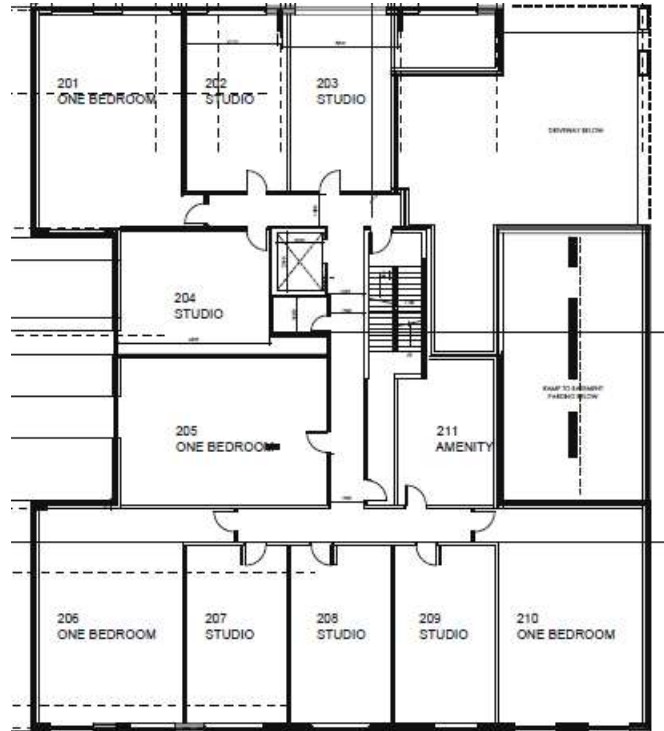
Exhibit S: Proposed second floor plan with six (6) studios and four (4) 1-bedroom units
